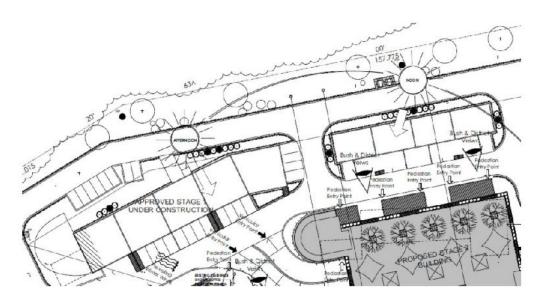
New Building Footprint (Source: Plans prepared by Gelder Architects, dated 15 November 2019)
